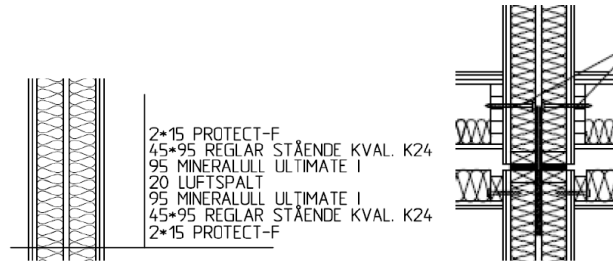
Drawings of the separating walls, i.e. inner walls (left) and the assemblage with the floor/ceiling (right).
